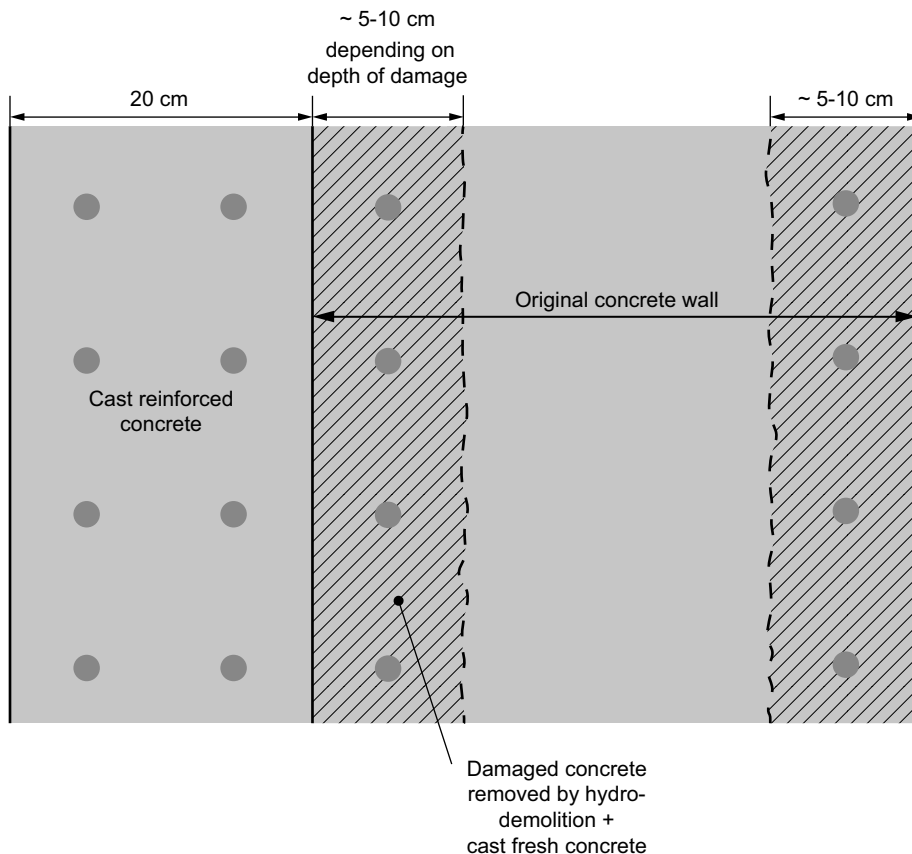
Illustration of a possible method to repair the concrete walls in 1BMA.
